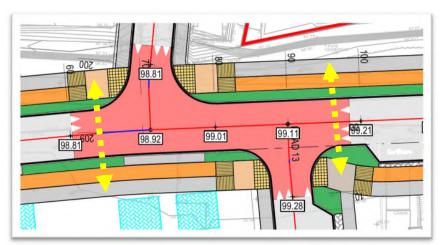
DBFL-RD-SP-DR-C-1101 P02, Pedestrian crossing facilities at junctions.
